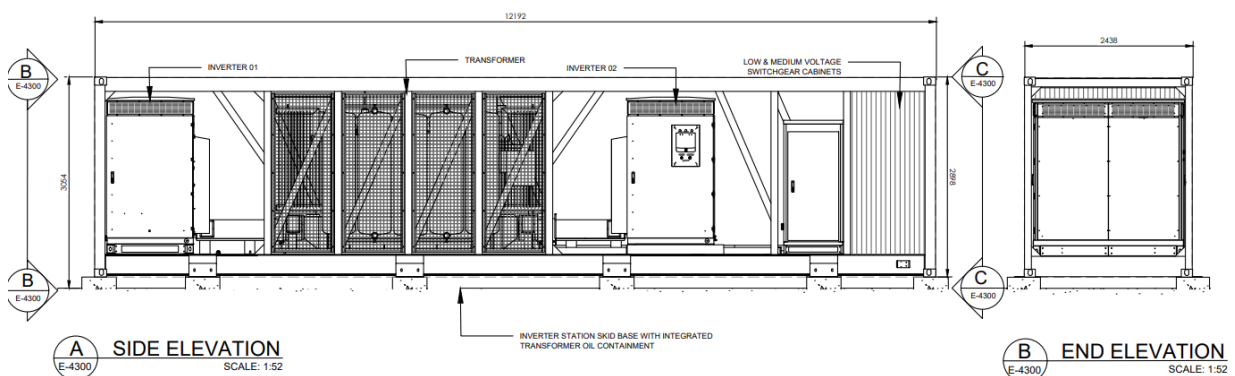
Inverter Side & End Elevation (Source: EDP Renewables)
